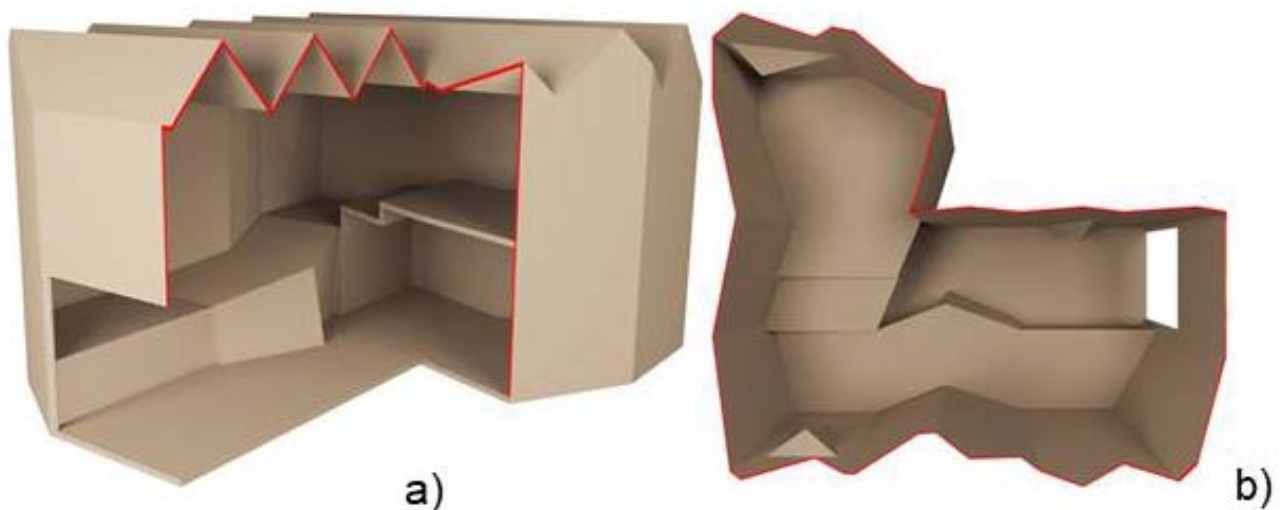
Experimentation field. a) project three-dimensional model cross-section; b) top perspective view
